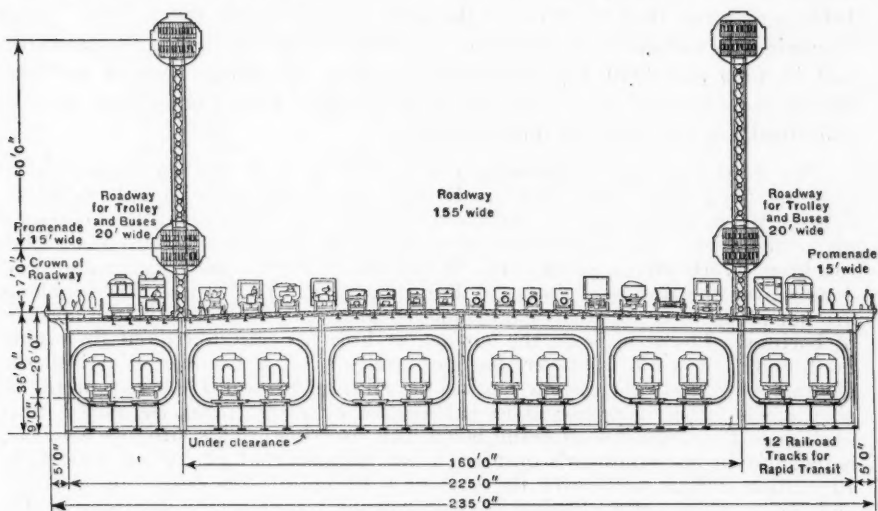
TYPICAL CROSS-SECTION; EYE-BAR SUSPENSION BRIDGE DESIGN, SUBMITTED IN 1923.
